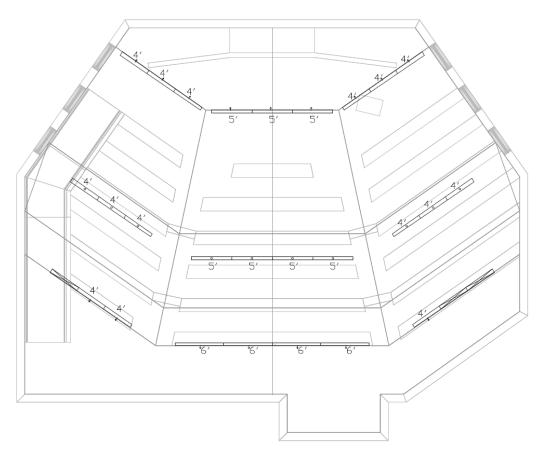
Lecture Hall Reflected Ceiling Plan – Diffusers Only
